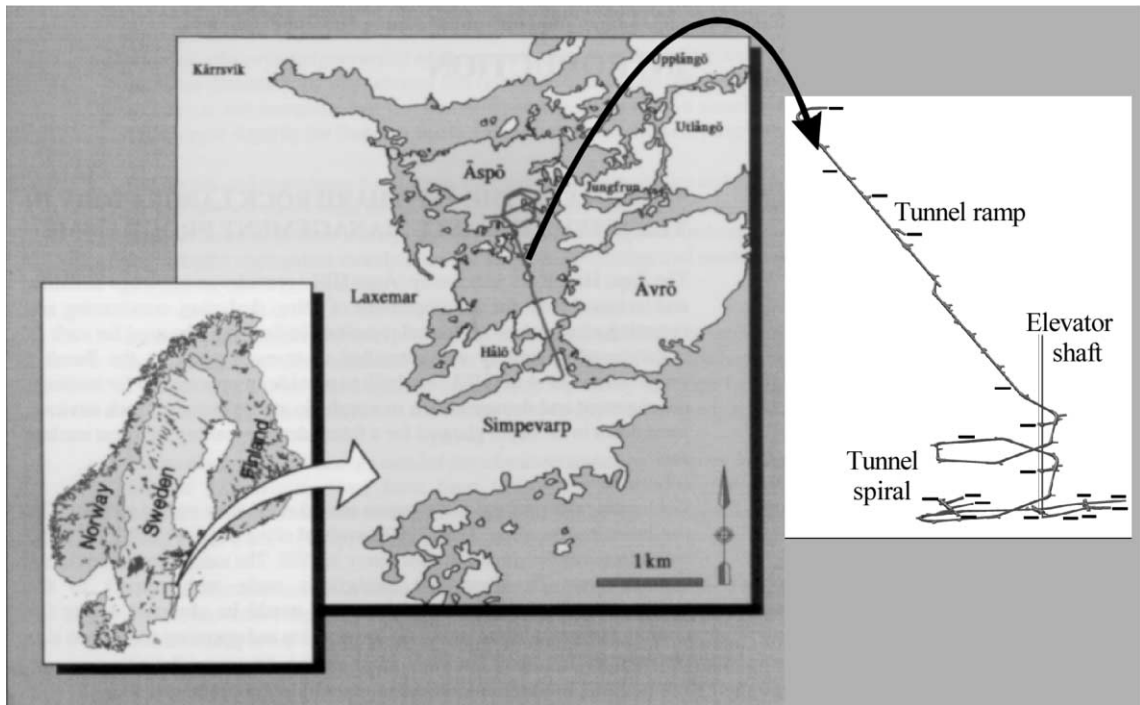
Location of the Äspö Hard Rock Laboratory and a 3D view of the underground facilities (tunnel and elevator) (modified after Rhén et al., 1997b).
